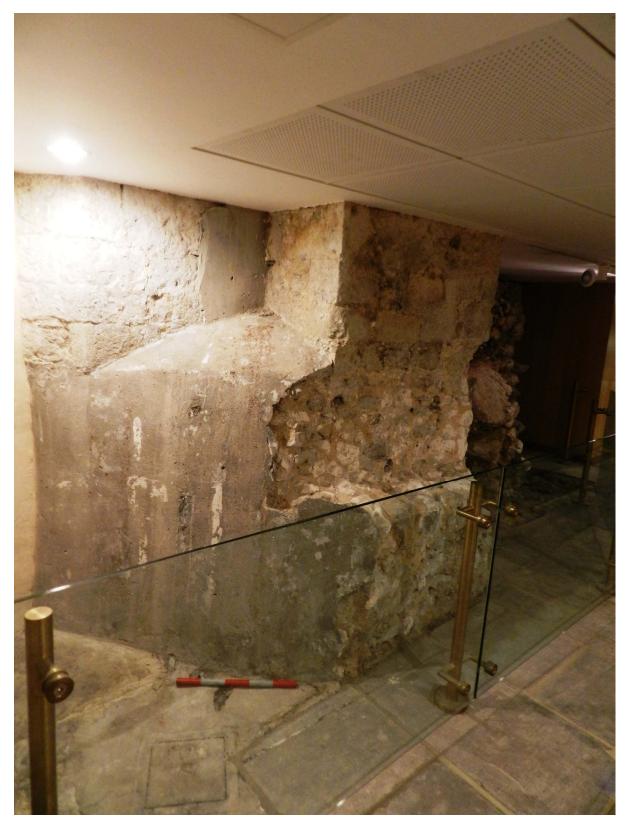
The foundations of the south-eastern stair turret, looking north-west
